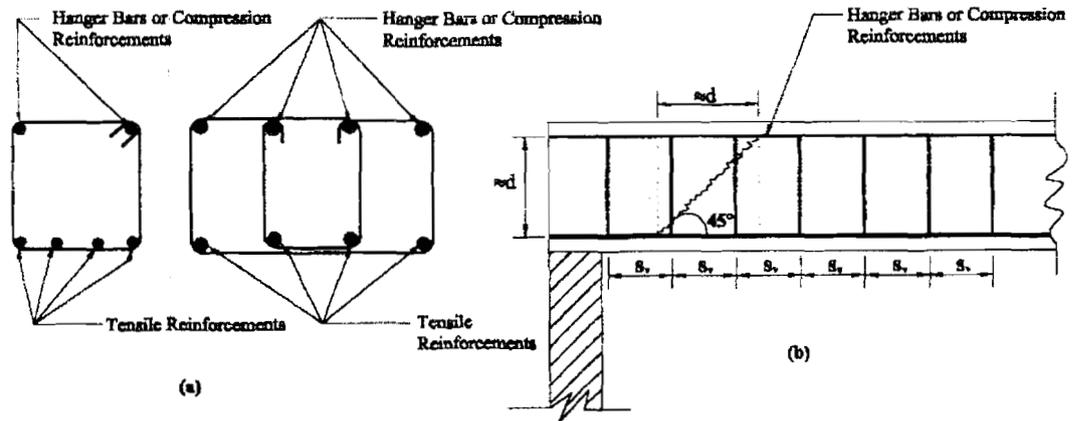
Vertical Stirrups to Resist Shear Force
